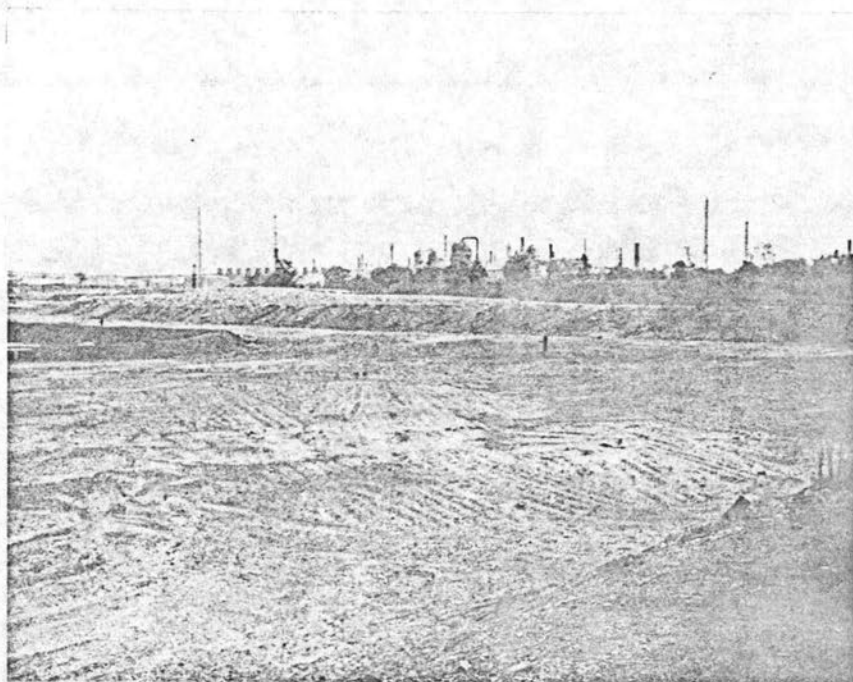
PAST DISPOSAL AREA 1 (WEST YARD)
